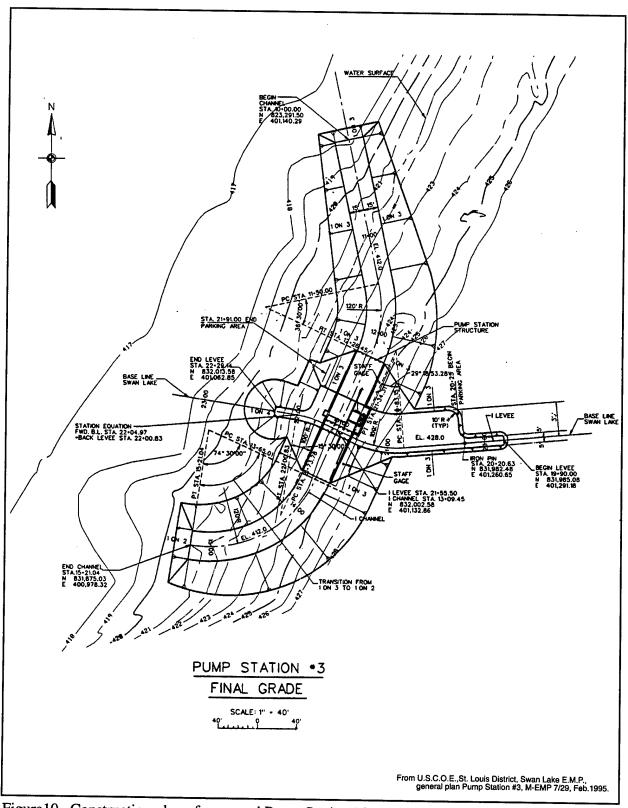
Construction plan of proposed Pump Station #3 and associated channels, exterior levee, and pump station access road, Swan Lake HREP/EMP.
